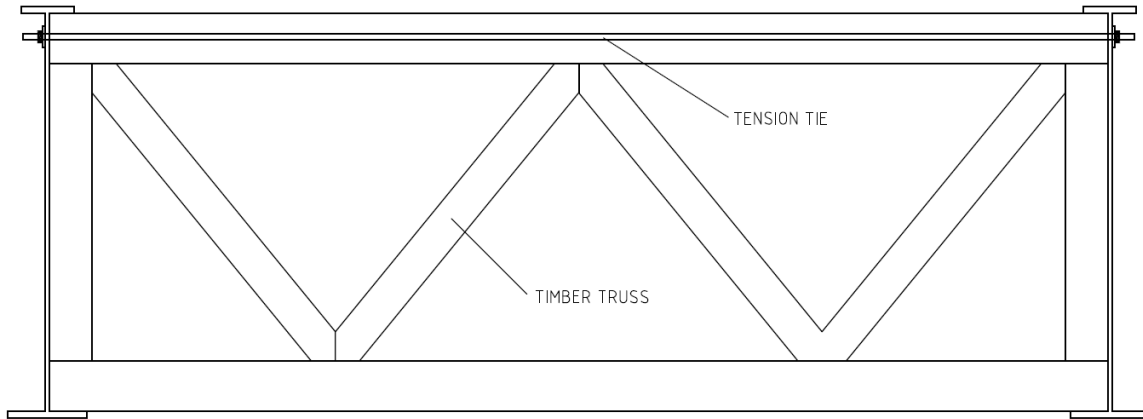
Tension tie and timber truss interconnecting the main girders (BRITEK Ltd)
